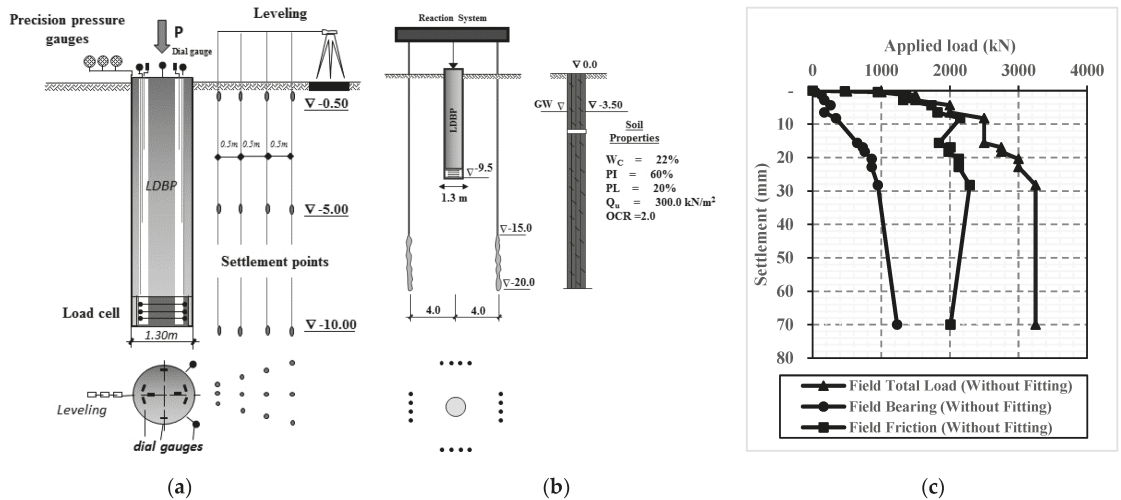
Large diameter bored pile loading to failure test (modified from [38]). (a) Measuring devices and instrumentation. (b) Test arrangement and typical soil profile with mechanical properties. (c) Field measurements of the loading test.
